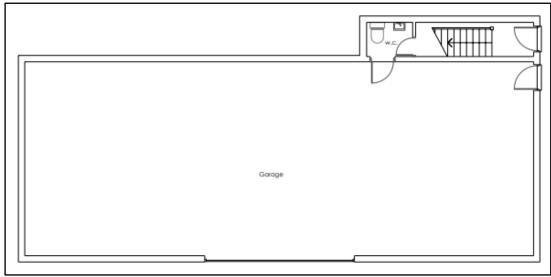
GARAGE BUILDING GROUND FLOOR PLAN (KENT BUILDING CONTROL)
